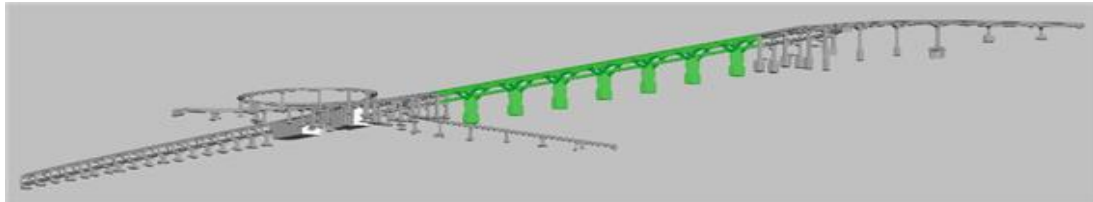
Example of Abstract Building Information for Cheong-Dam Bridge
